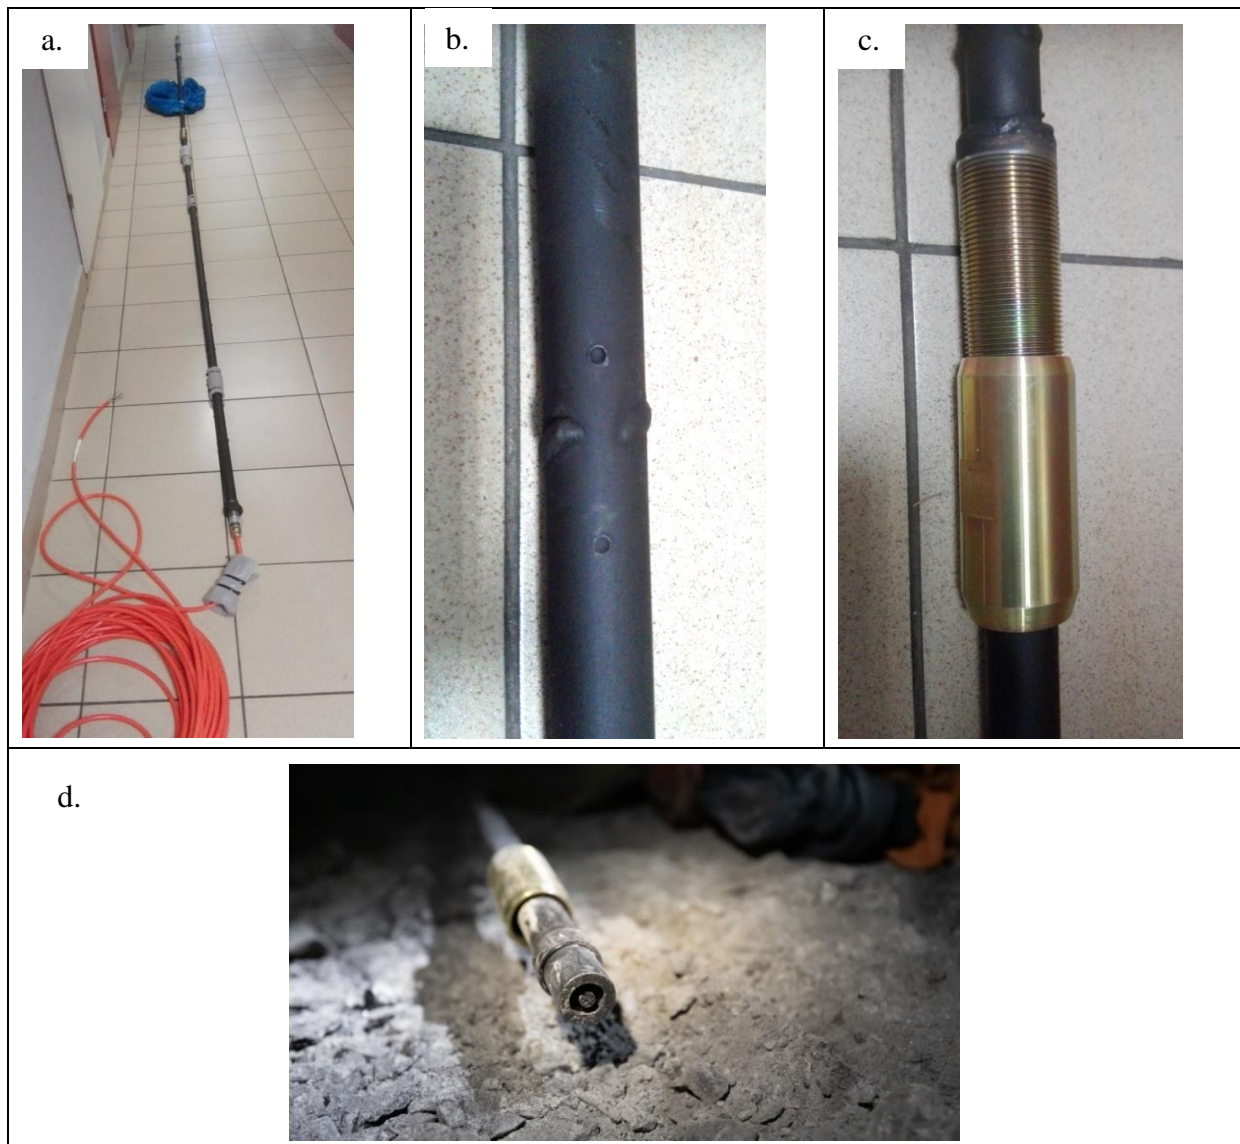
Rock bolt instrumented with Vibrating Wire sensor, a. general view, b. section of the rock bolt with the Vibrating Wire sensor, c. coupler for rock bolt sections, d. socket for connecting rock bolt sections.
